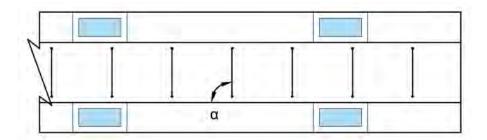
Plan View of 0 Degree Skewed ITBC
